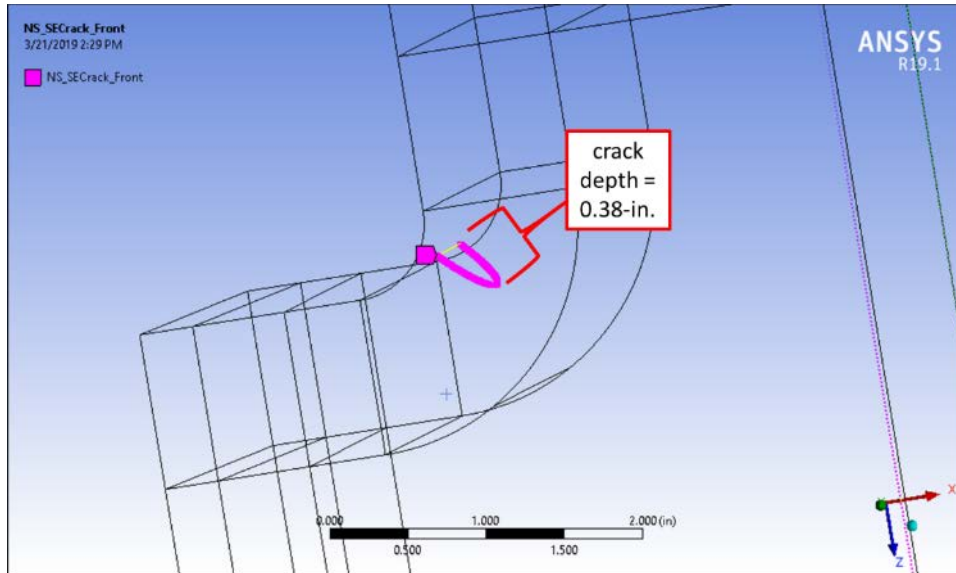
Wireframe view showing the depth of the Fremont Street pop-in crack. The purple line indicates the crack front.
